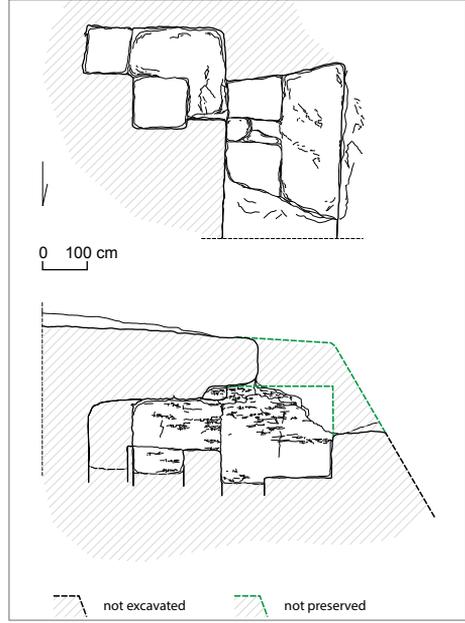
Chapel 35 in the east bank of the Dry Moat: plan and east–west cross-section, with a reconstruction of the collapsed part (University of Warsaw West Saqqara Project | drawing K. Kocyla, modified K. Kuraskiewicz)
